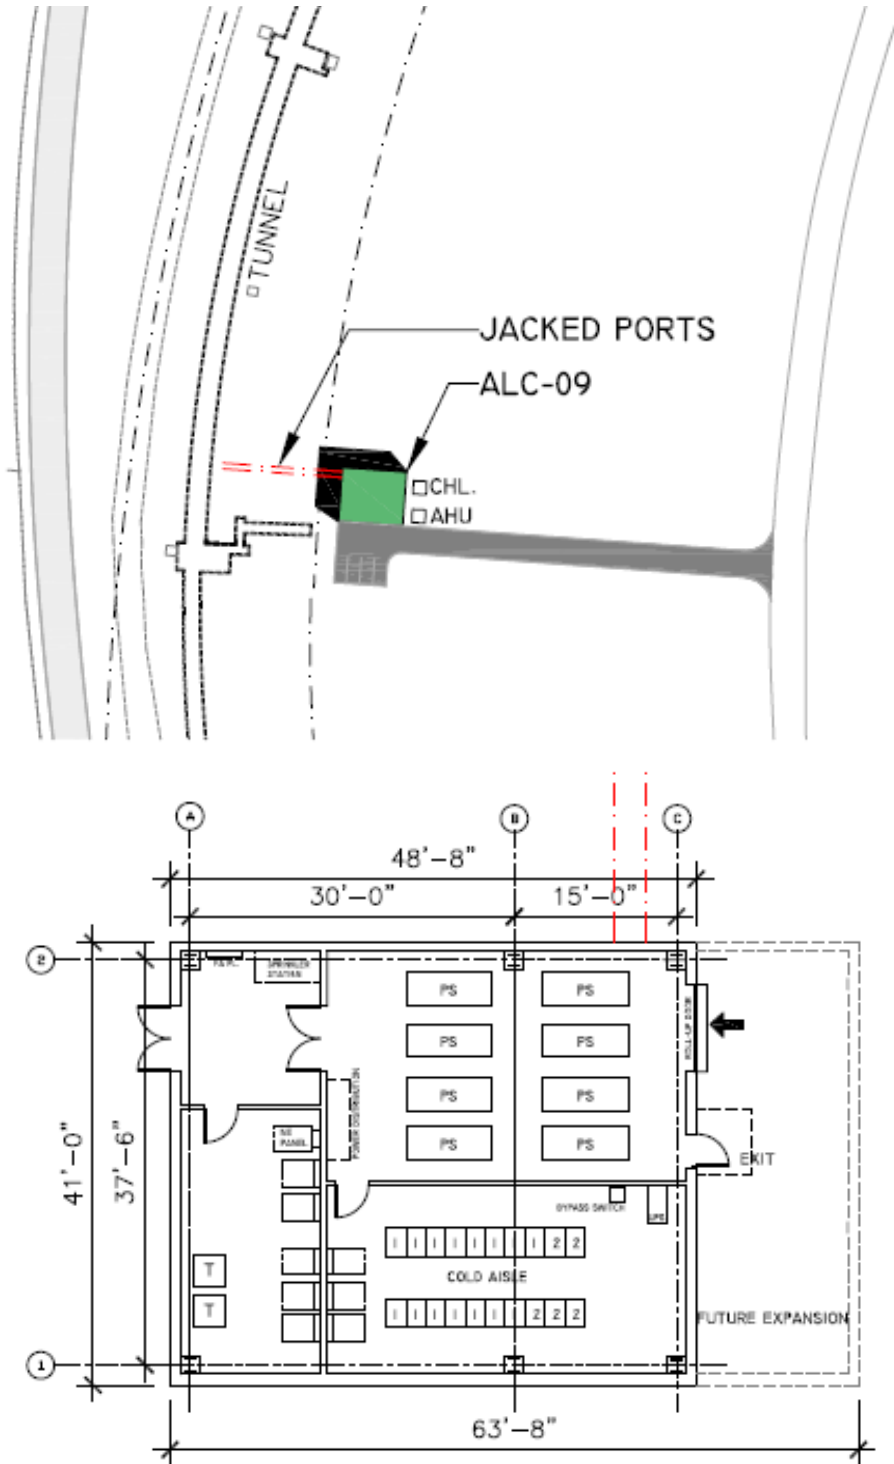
Alcove layout Number 2. Top: site plan. Bottom: floor plan.
